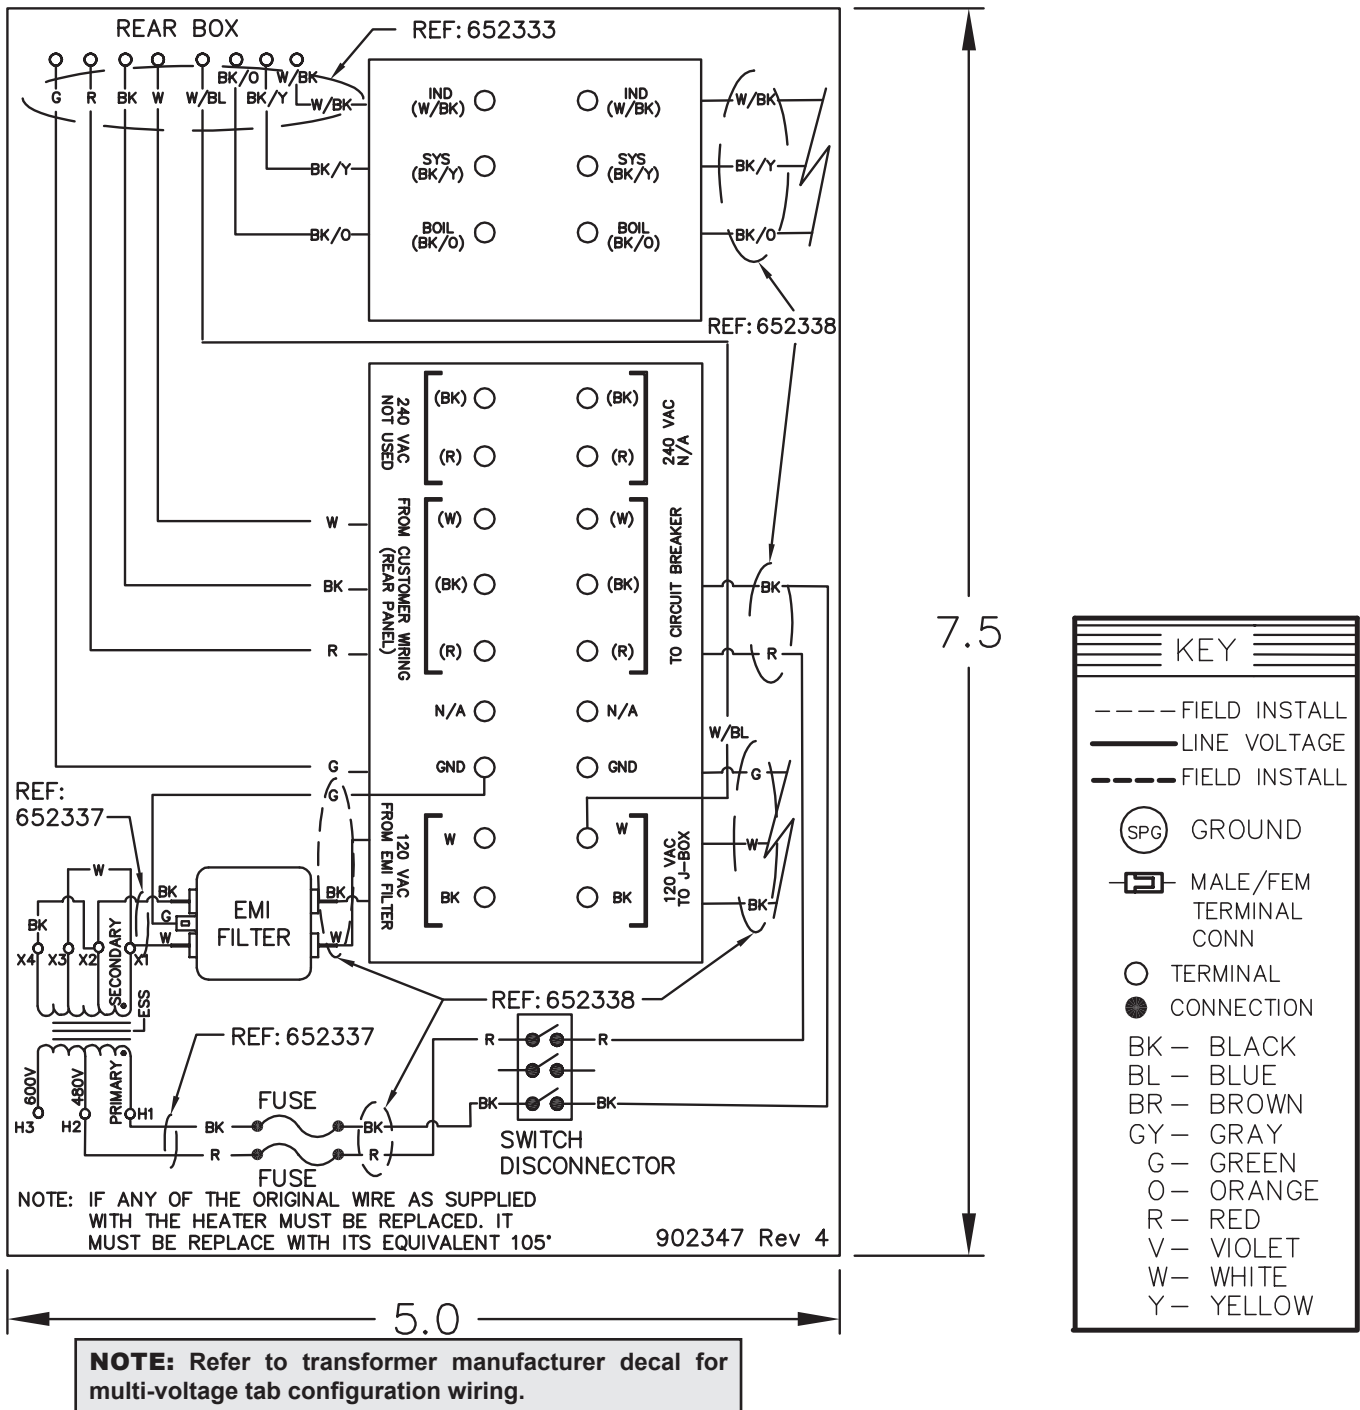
Wiring Diagram 120VAC Blower, 480/600VAC Transformer
